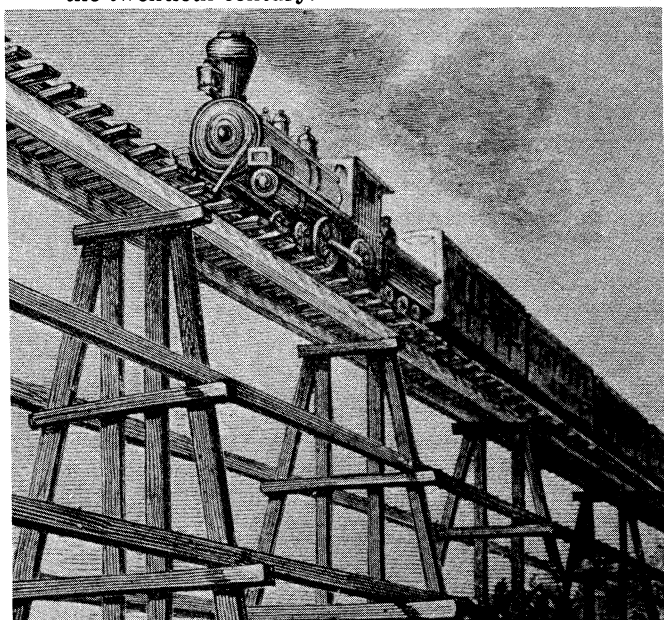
An American wood trestle bridge, late nineteenth century. The wood trestle construction was quite common on American rail lines west of the Appalachians and frequently caused some anxiety among British travellers accustomed to more rigid structures.
